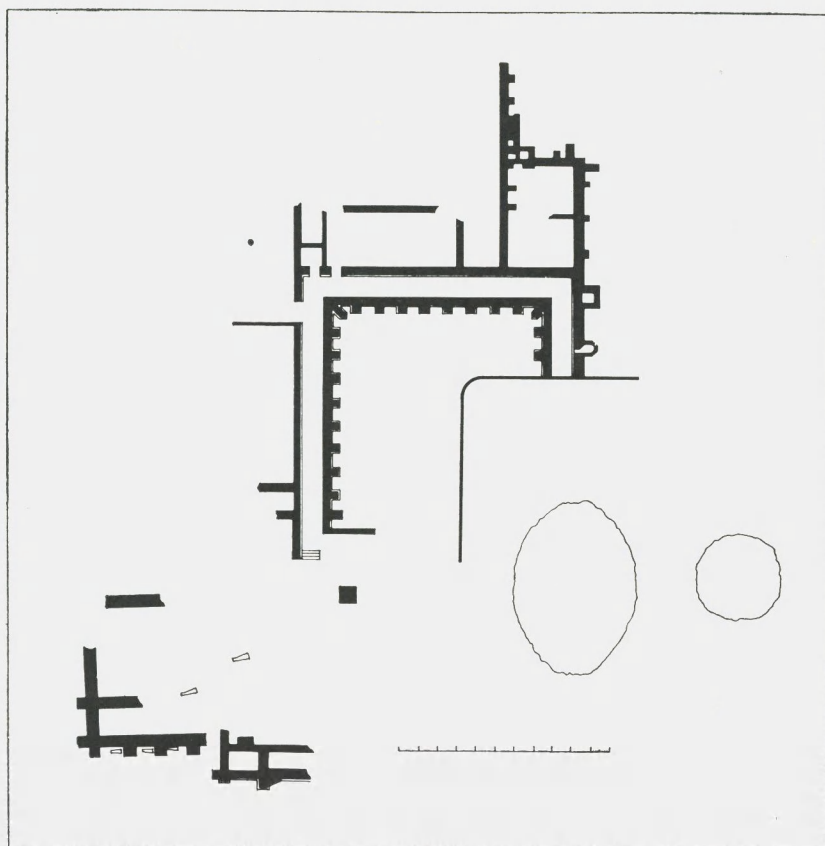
Ground plan of Bradford Rudge's excavations (1839) showing existing garden wall with curved corner.
